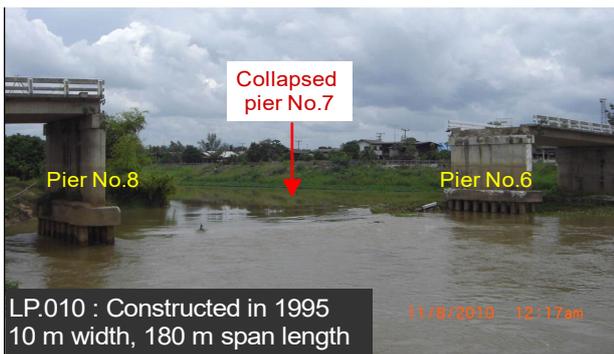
The damaged LP.010 bridge in Thailand in 2010.
